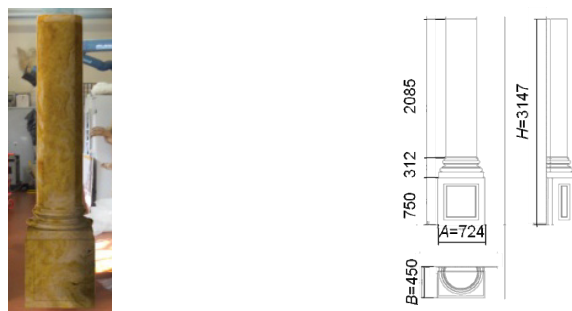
View and geometrical dimensions (in millimetres) of the column.
